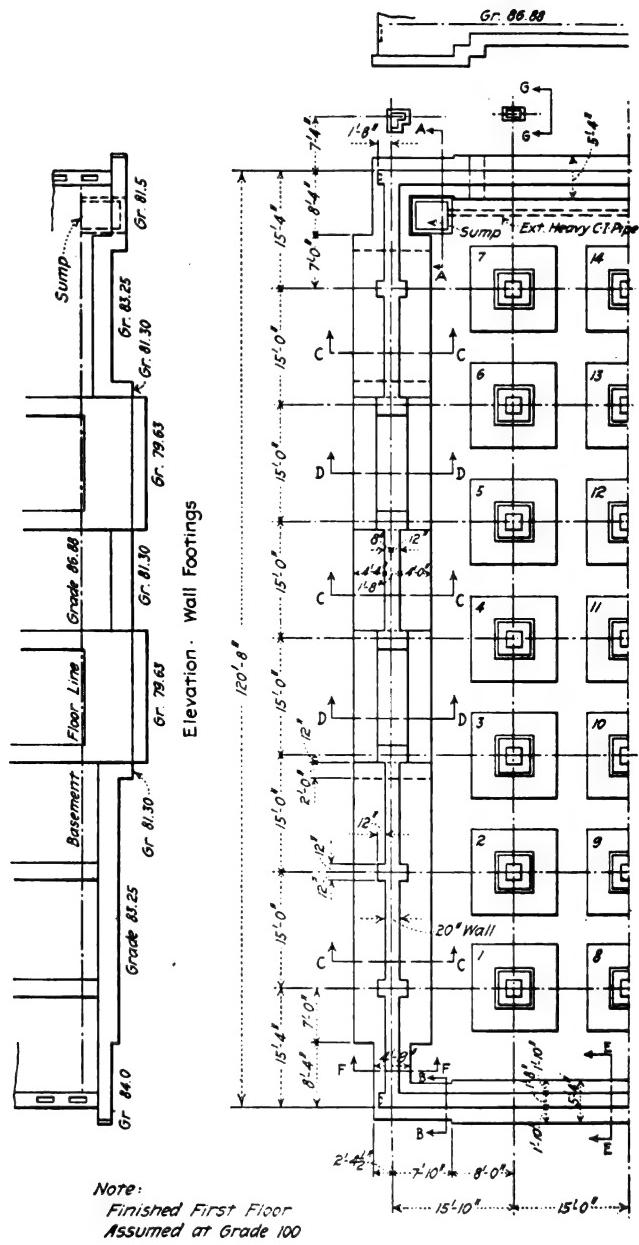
A.—Winchester Repeating Arms Co.'s building, New Haven, Conn.
